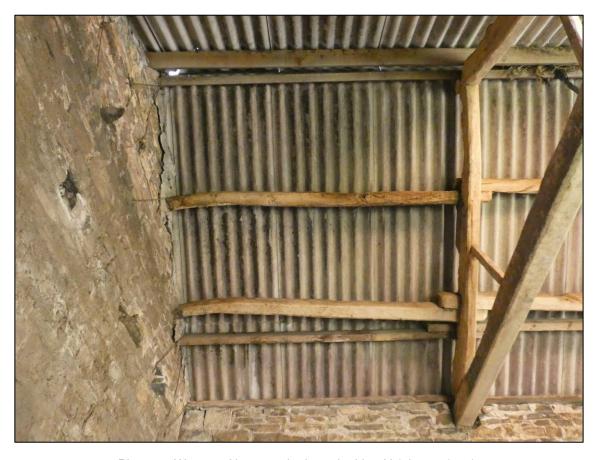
West roof bay, north slope, looking N (photo 1/248).
